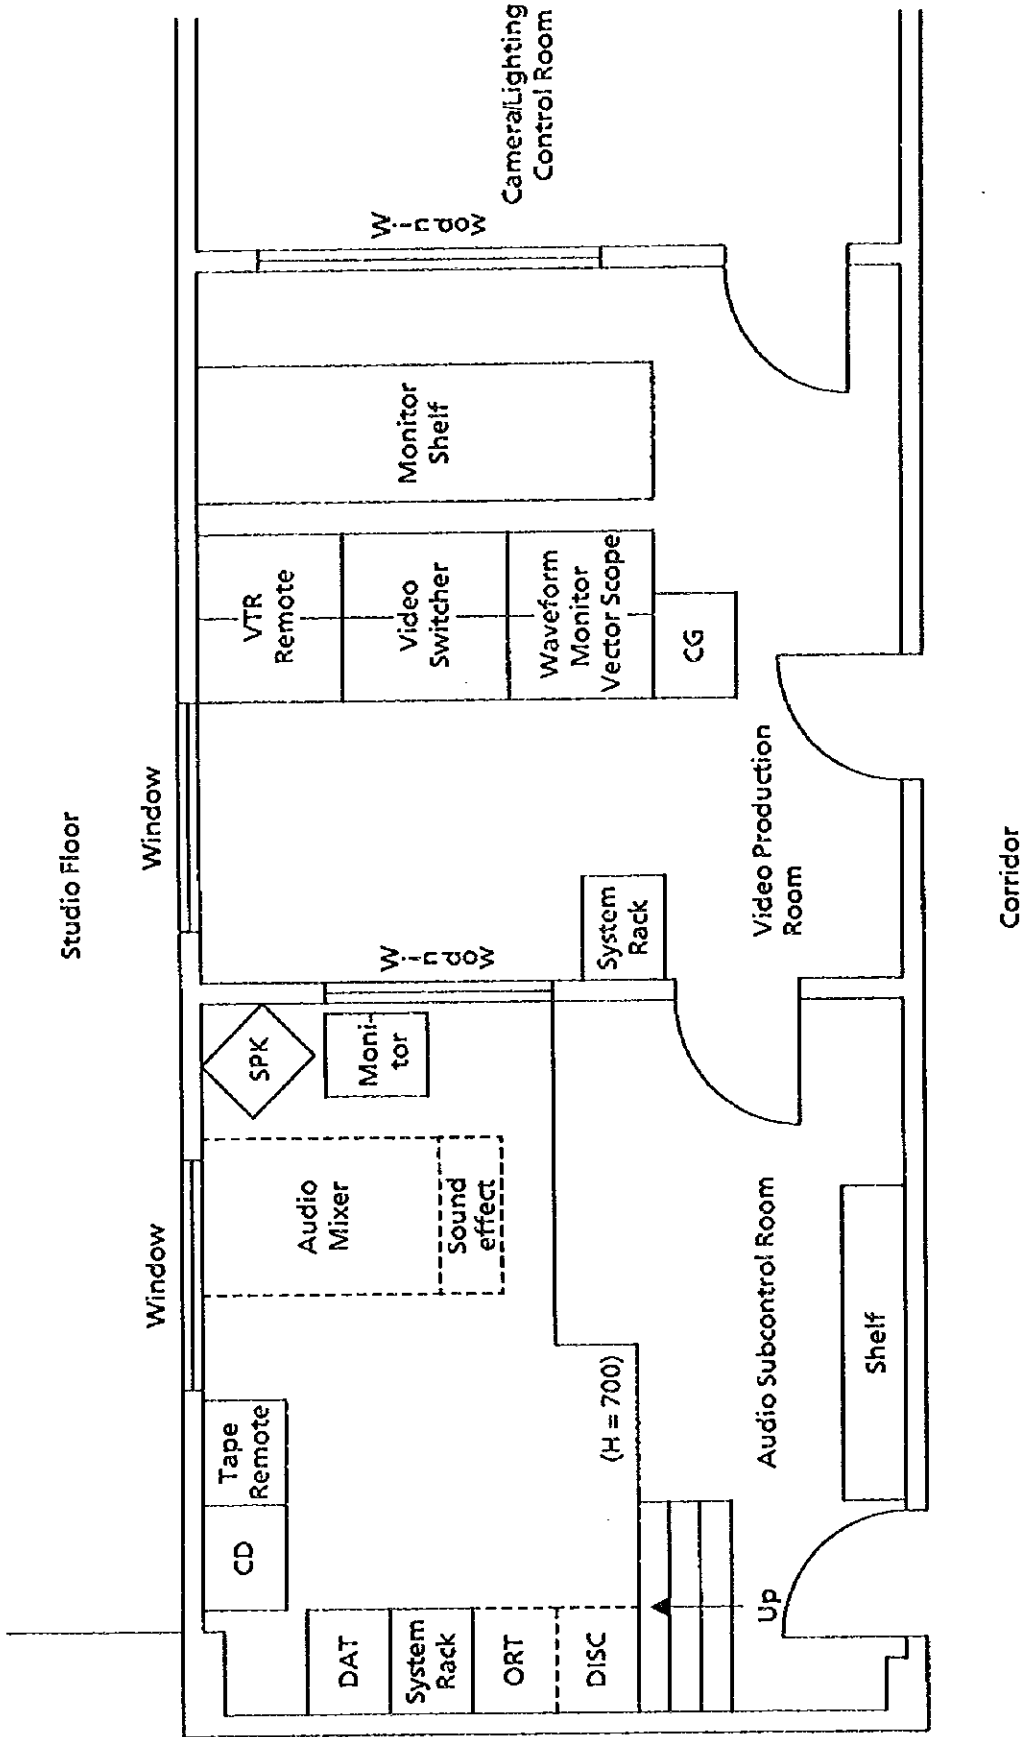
Equipment Layout of Video Production/Audio Sub Subcontrol Room
